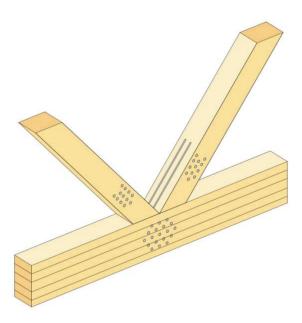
Dowel-type connection with multiple slotted-in steel plates
